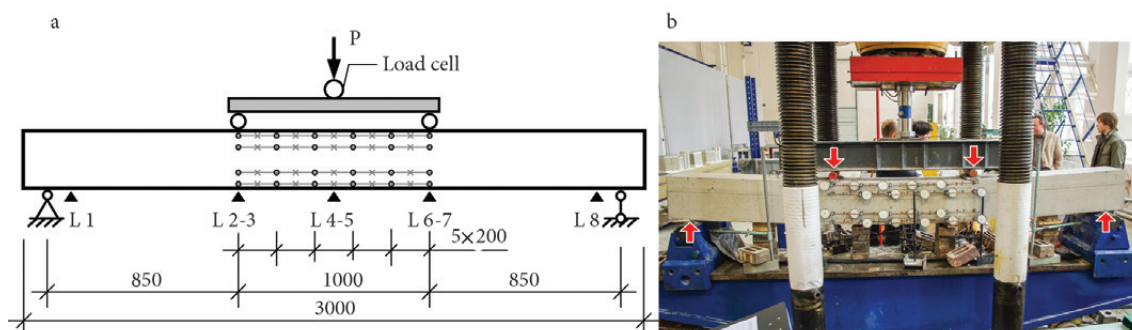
Test set-up: a – layout of mechanical strain gauges and LVDT; b – test set-up
